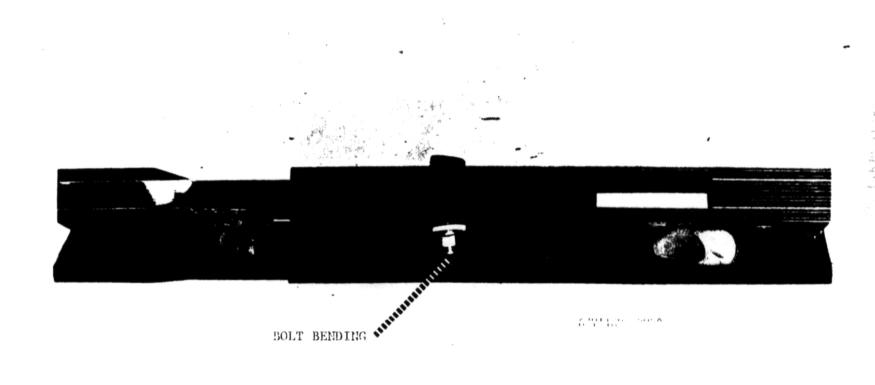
DOUBLE SHEAR TENSION TESTS - BOLT BENDING FAILURE
